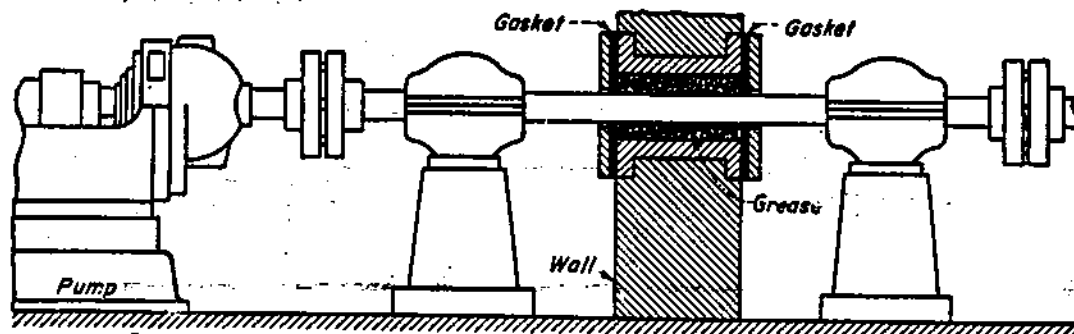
Firewall extension provided by separate shaft supported by two pedestal bearings, one on either side of wall.
